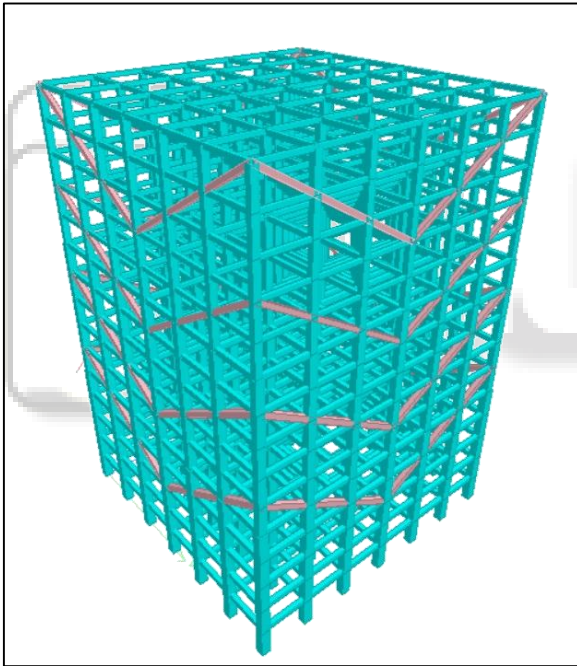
Rendered view of 15 Storey Building with V Bracing.
